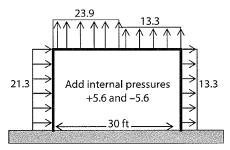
Design Pressures for MWFRS when Wind is Normal to 60-ft Wall
